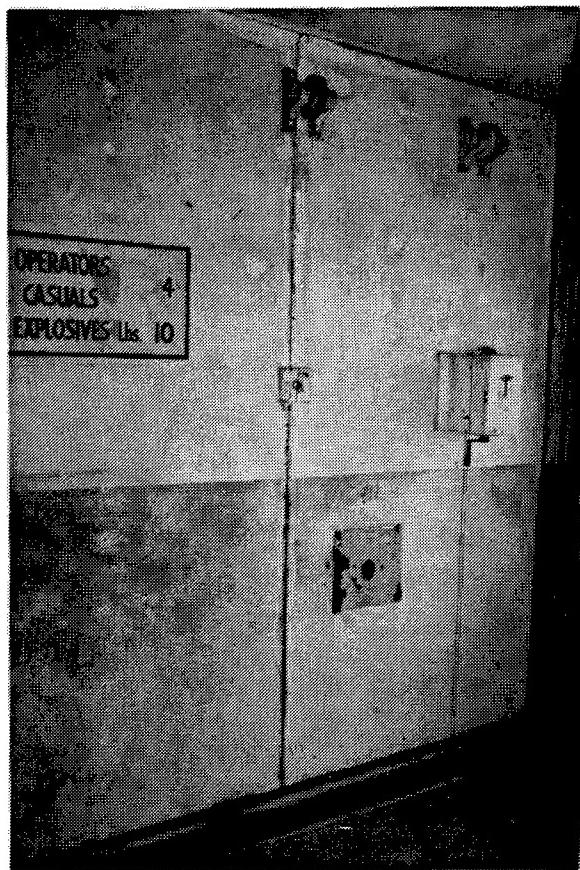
Building DT-7: Interior view of this Metal Parts Loading Building.
